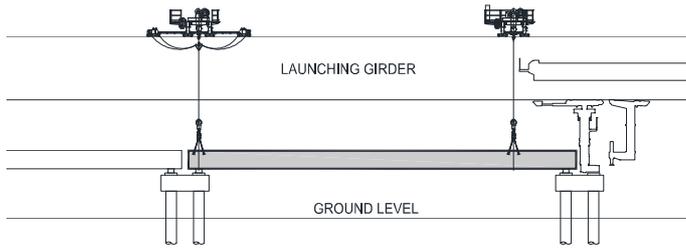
Launching of the beam in final position / Varo della trave nella posizione finale.
